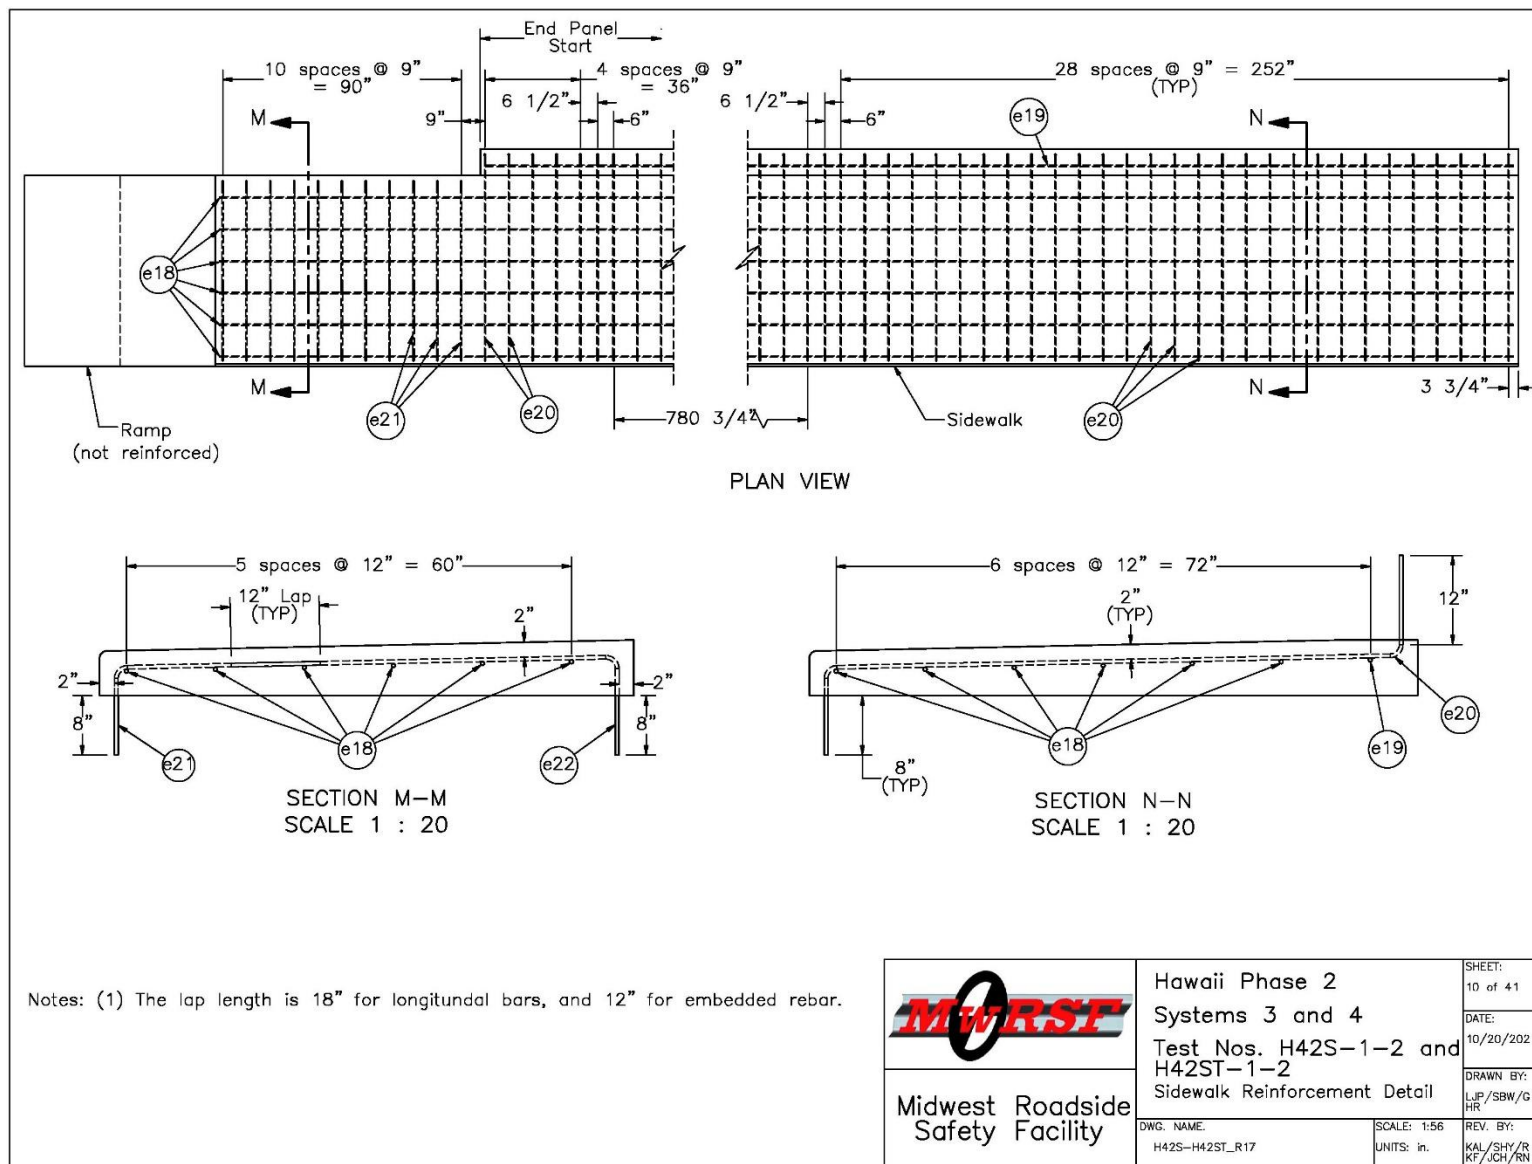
Sidewalk Reinforcement Detail, Test Nos. H42S-1 and H42S-2
